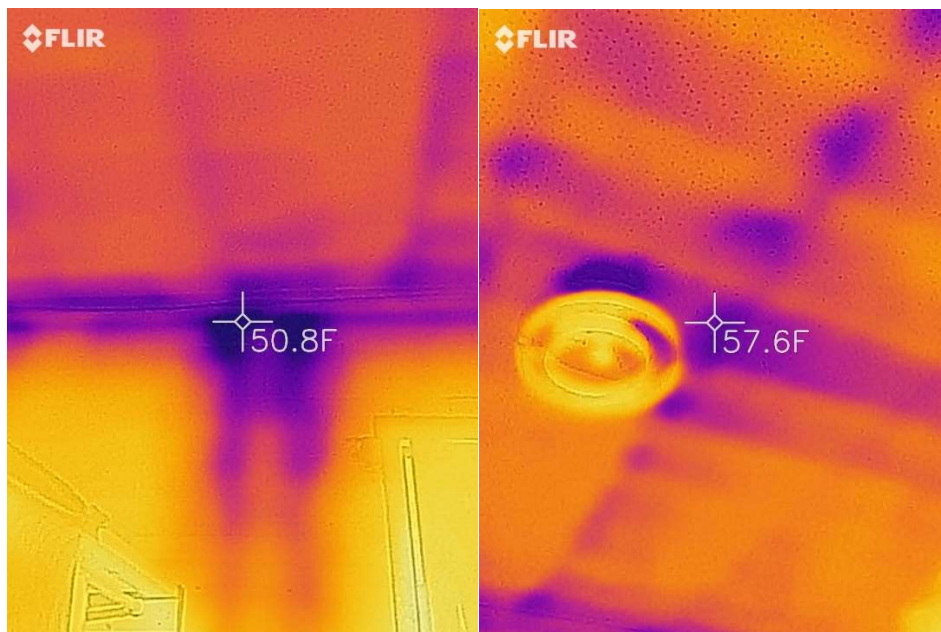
Right Storage Room Ceiling – Circular Fixture is the Light
